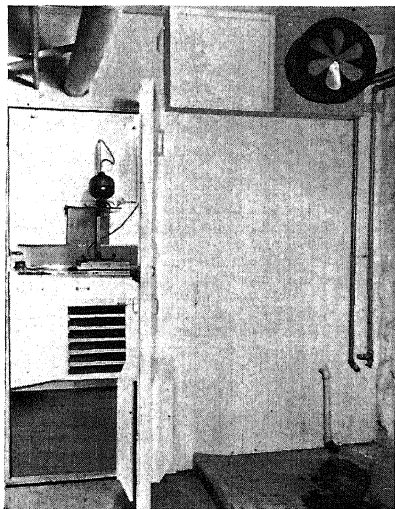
Outside of Mr. Davis' photographic laboratory showing position of exhaust fan. Note light trap ventilator on door.
